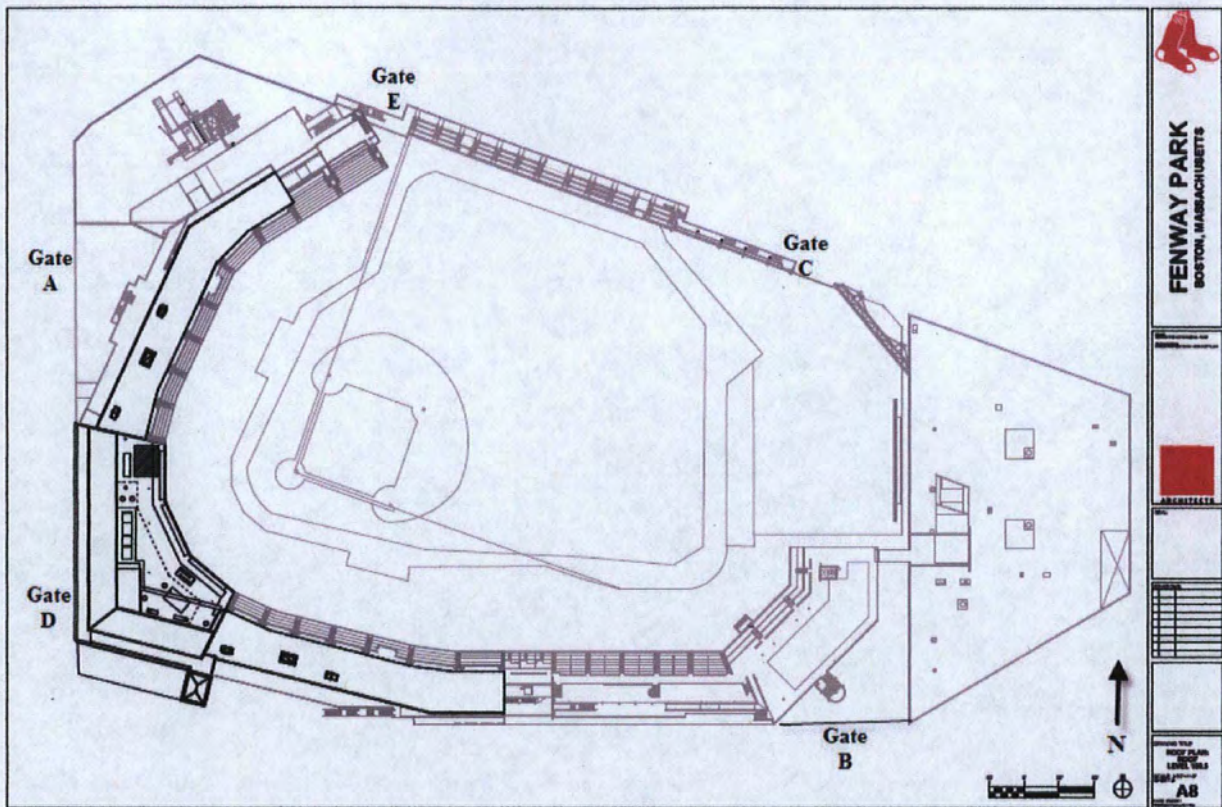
Fenway Park, 2011, Key Plan with Gates shown
